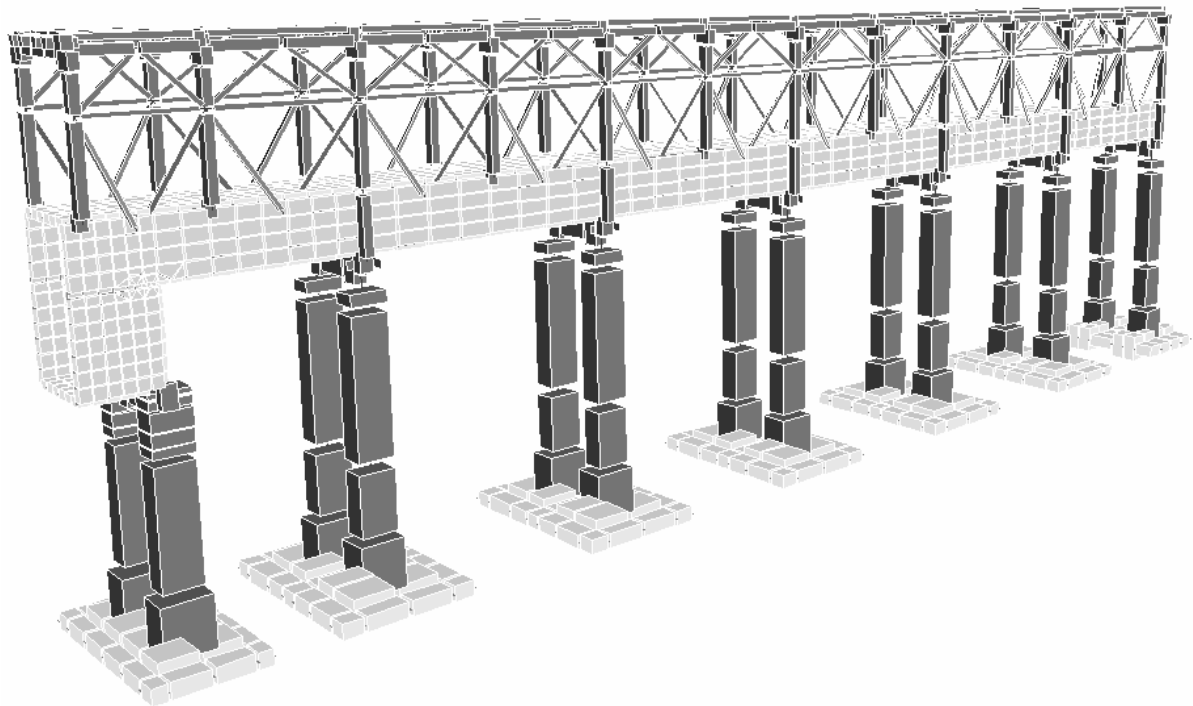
Seismic strengthening of all MF columns with reinforced concrete jacket
